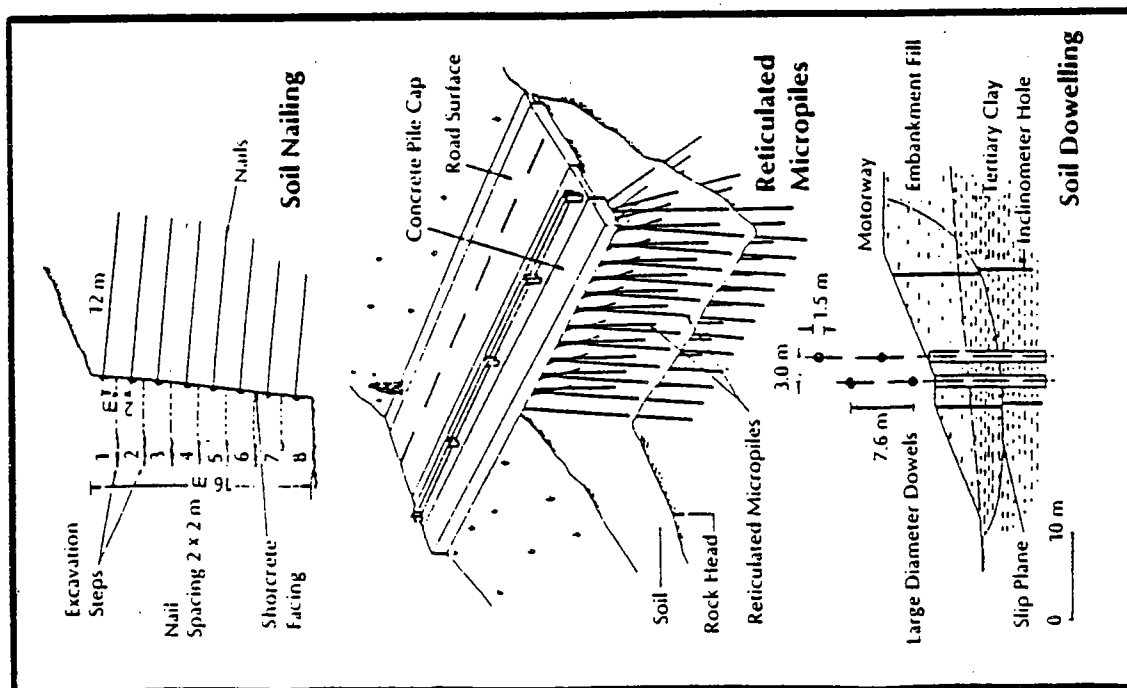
The family of insitu soil reinforcing techniques (Bruce and Jewell, 1986)
